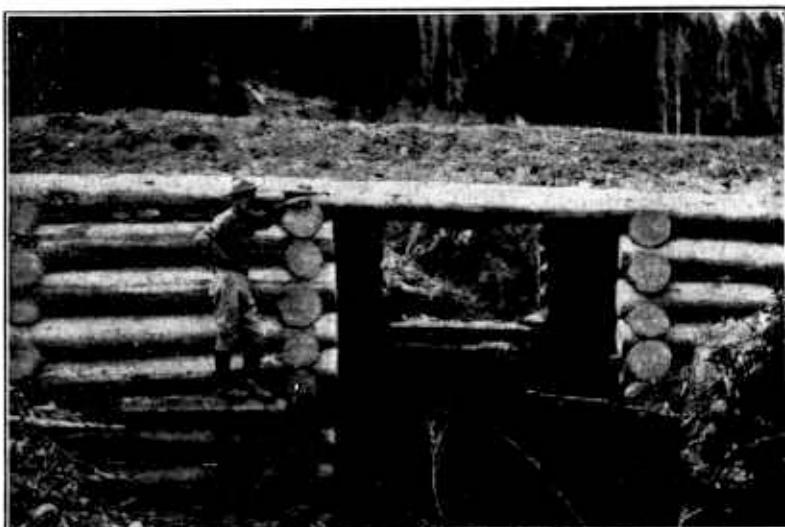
A 10 by 6 foot log culvert. The span and height can be varied to suit local needs.
